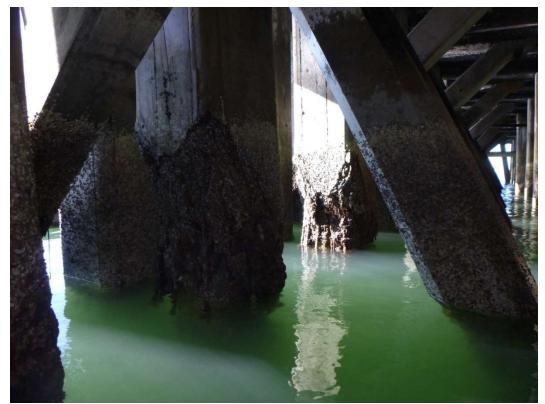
Deterioration of lower part of pile extension at Pier 3
